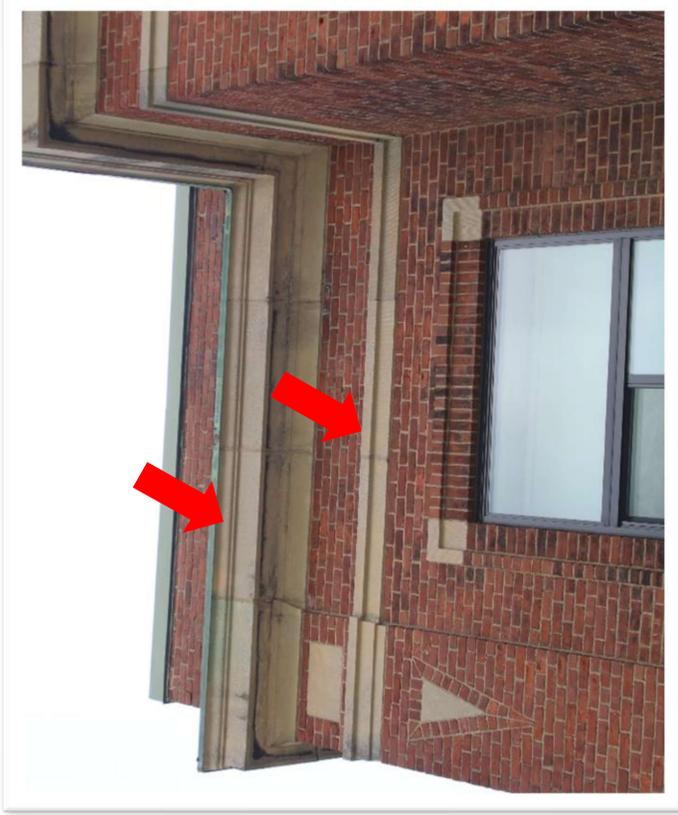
Photo shows precast concrete cornice and upper band that runs along perimeter of historic building.
